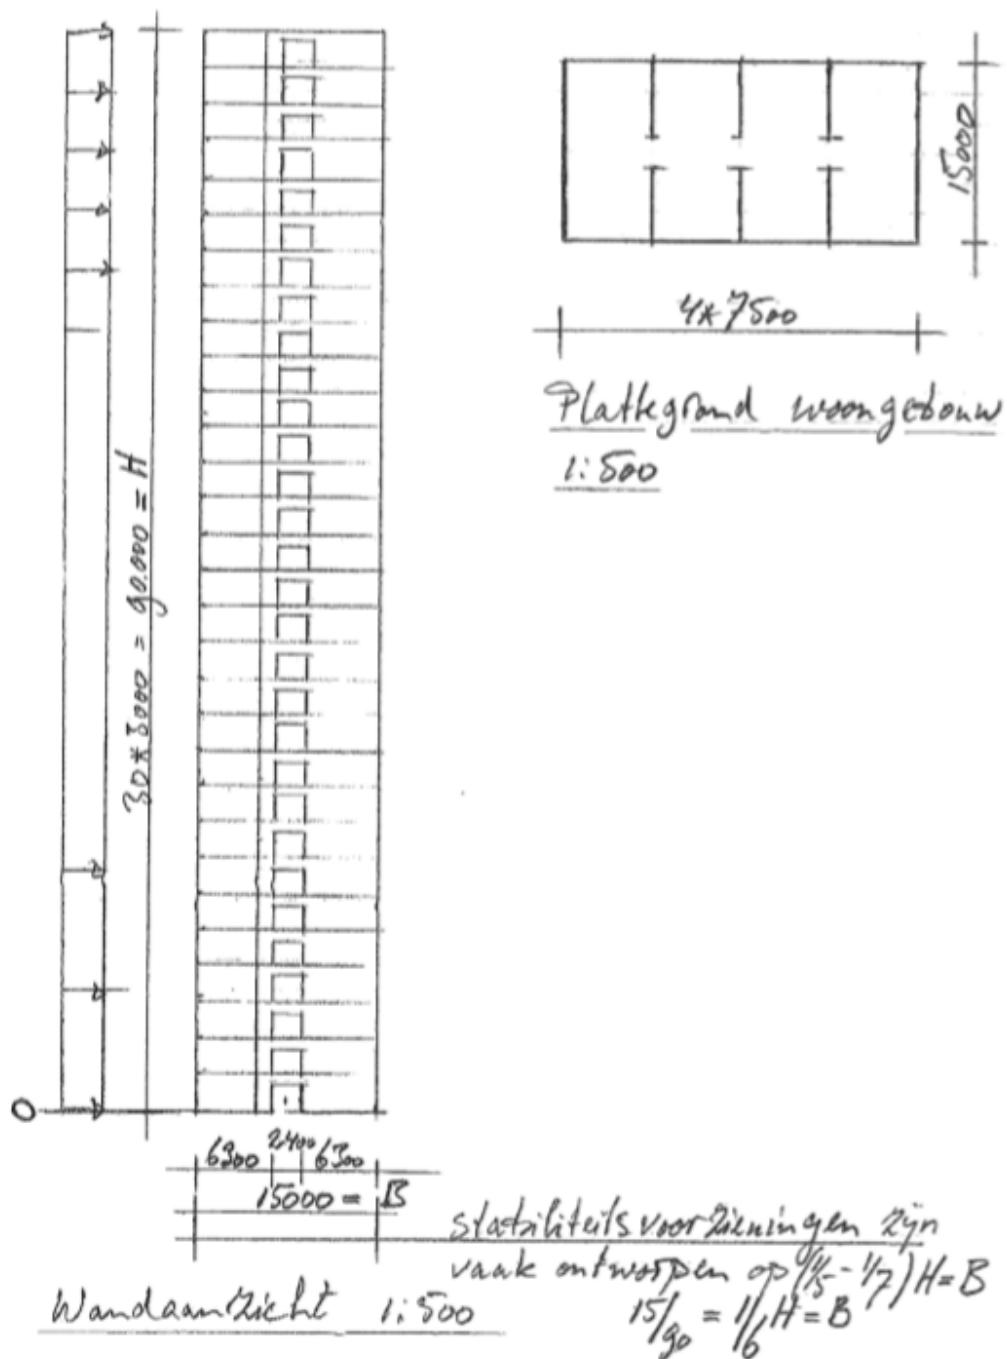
Side view and plan of the coupled walls system, example 1
